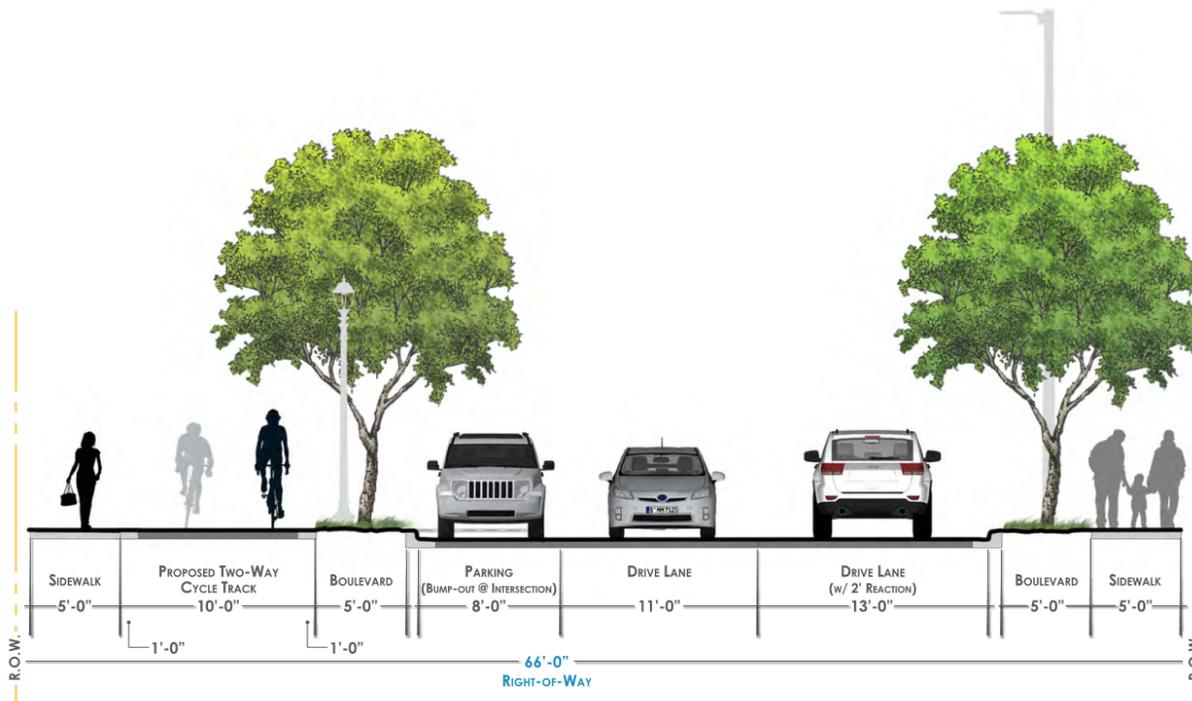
Cycle Track Connected to Sidewalk – Alternative A (Looking North)
